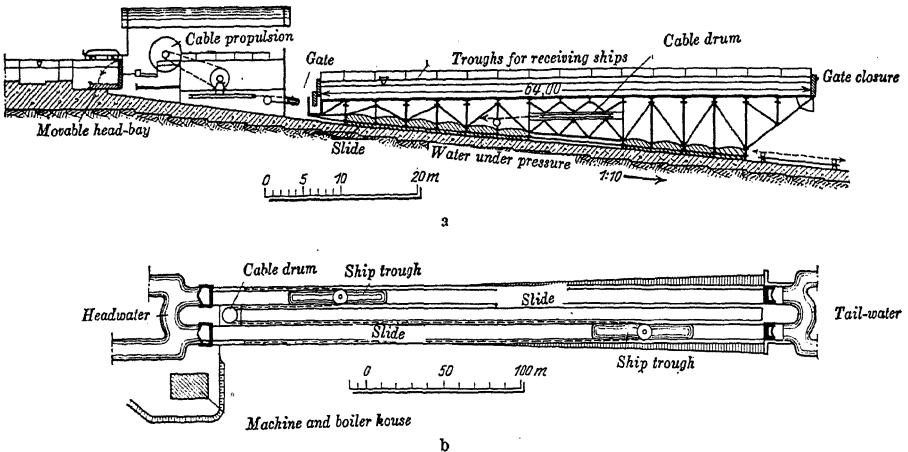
a and b. Diagrammatic sketch of arrangement for dry transportation over an inclined plane. Upper figure shows section, lower figure plan view
